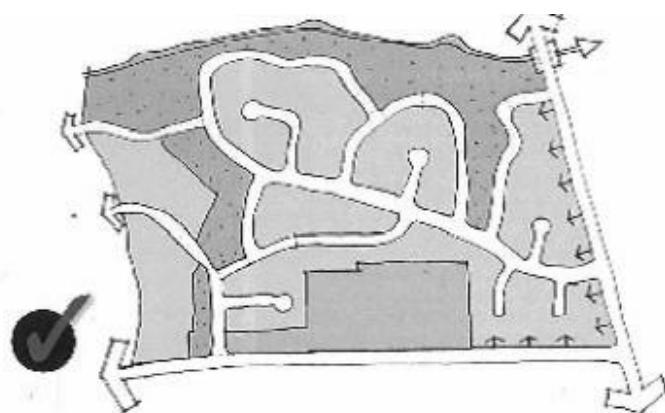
Connection of streets into surrounding networks encourages easier traffic and pedestrian flows
